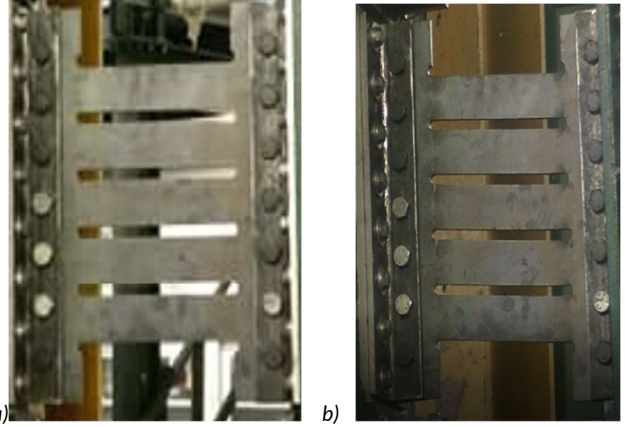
Photo of Specimens A4: a)Start of the test,b) Fracture-end test
